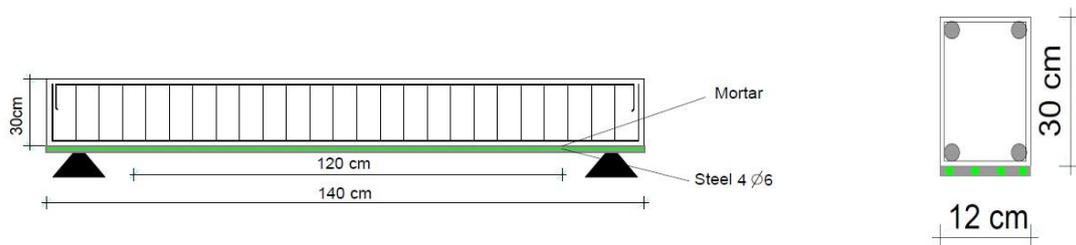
Longitudinal and mid span cross-section of strengthened specimen (B-MS)
